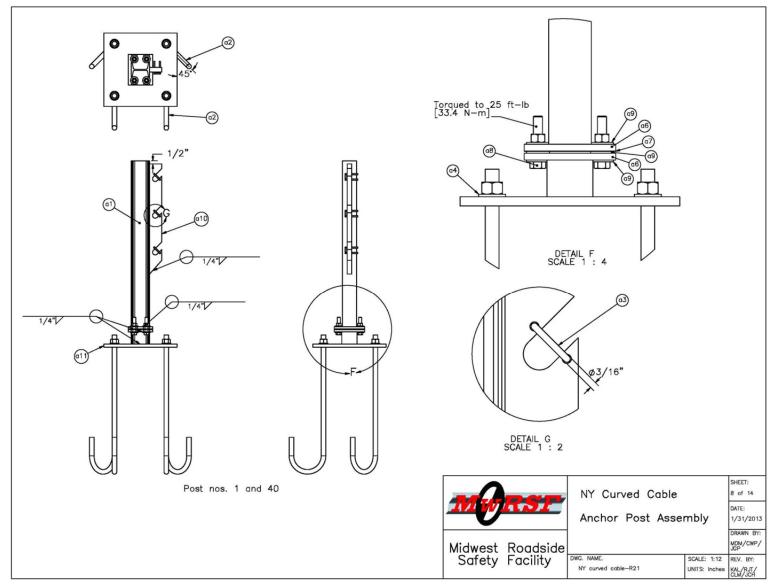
Anchor Post Assembly Details, Test No. NYCC-1
